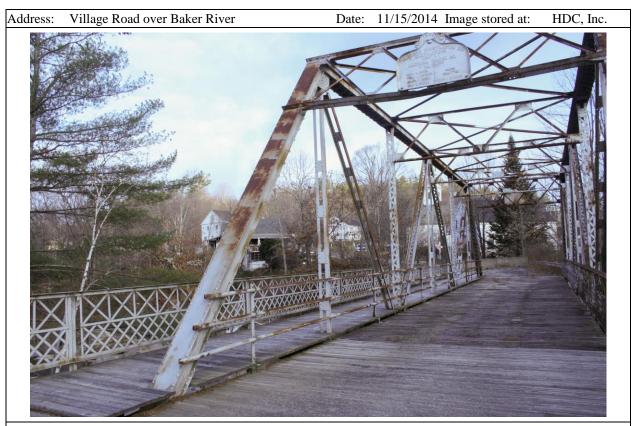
description: Bridge deck, sidewalk, railing and truss frame details.
